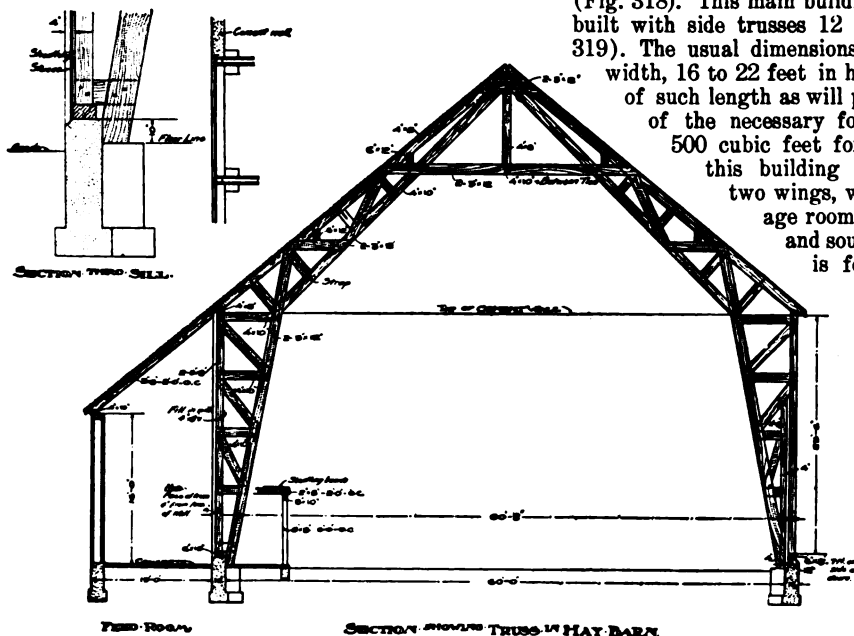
Section of the main building (hay barn) showing the wooden side trusses. The side trusses are placed twelve to sixteen feet apart.
